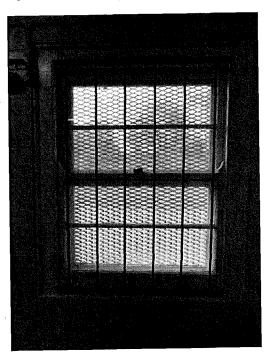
ACMA Facility Main Building interior sash window with interior and exterior bars.\
